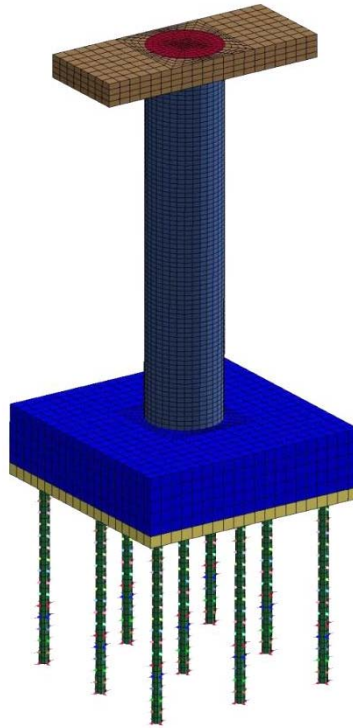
Single circular pier with cap beam, 8 m long pipe piles and soil springs
